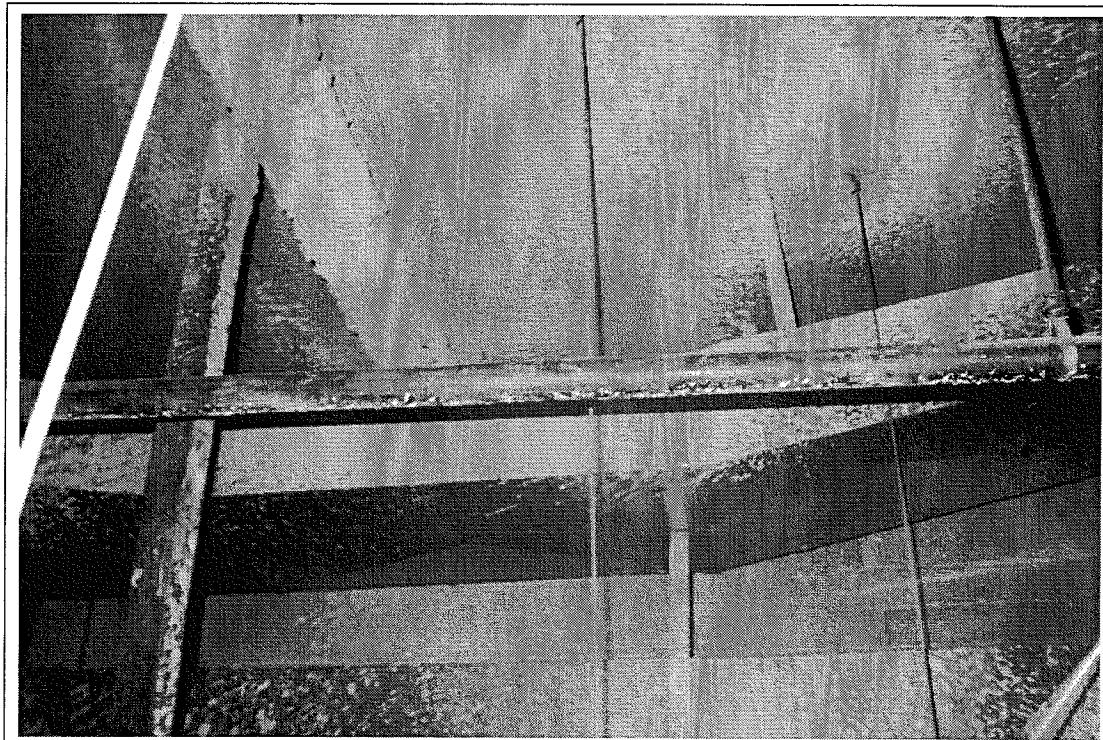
View of fireproofing applied to steel I-beams and overspray on decking – above Men's restroom in front lobby (north end)
